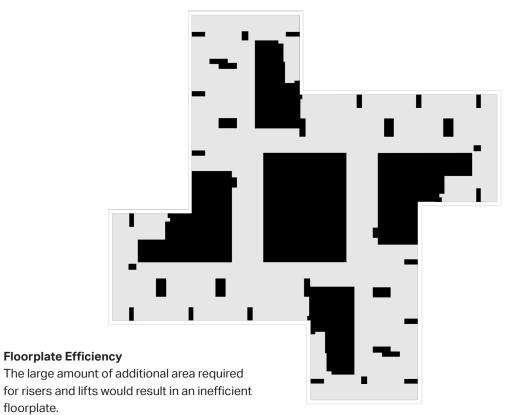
Impact of changes on existing structural floor slab for hotel use (mixed use)
